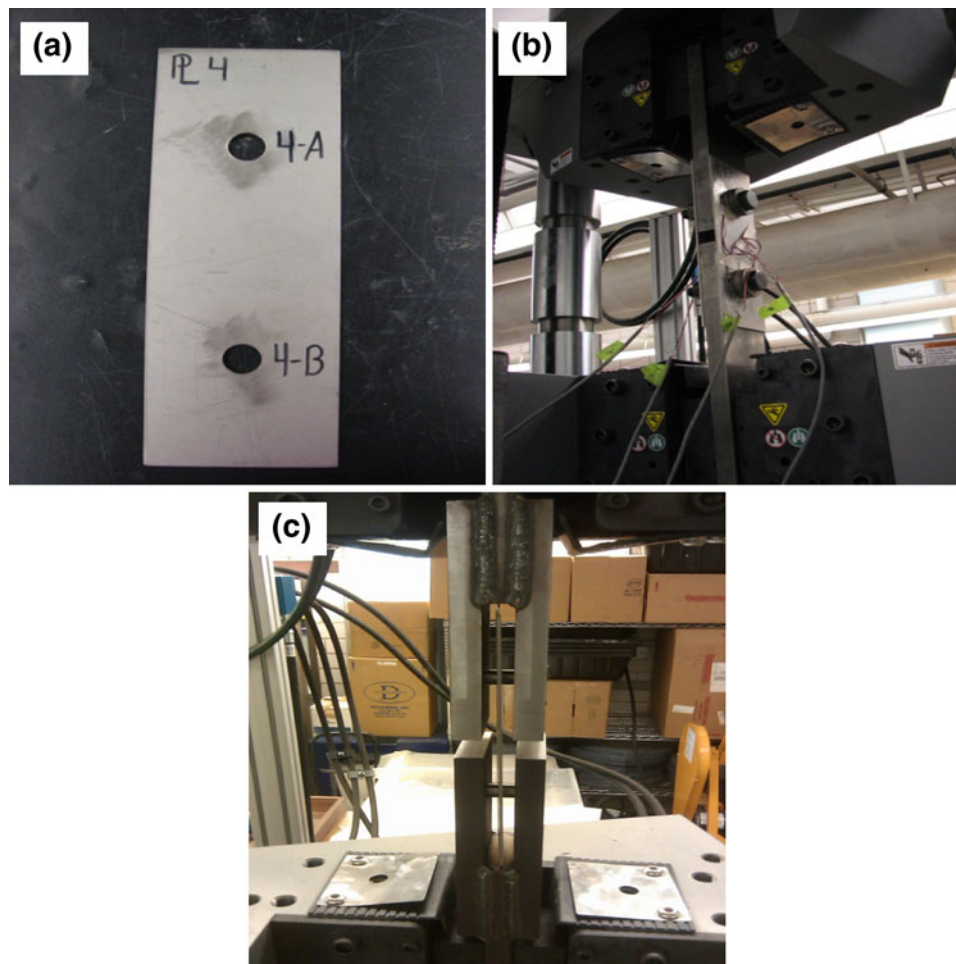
(a) The standard test sample used in this study, (b) A A490 bolt used to form a symmetric butt joint, and (c) the titanium alloy sample with test fixtures mounted on the universal test machine
